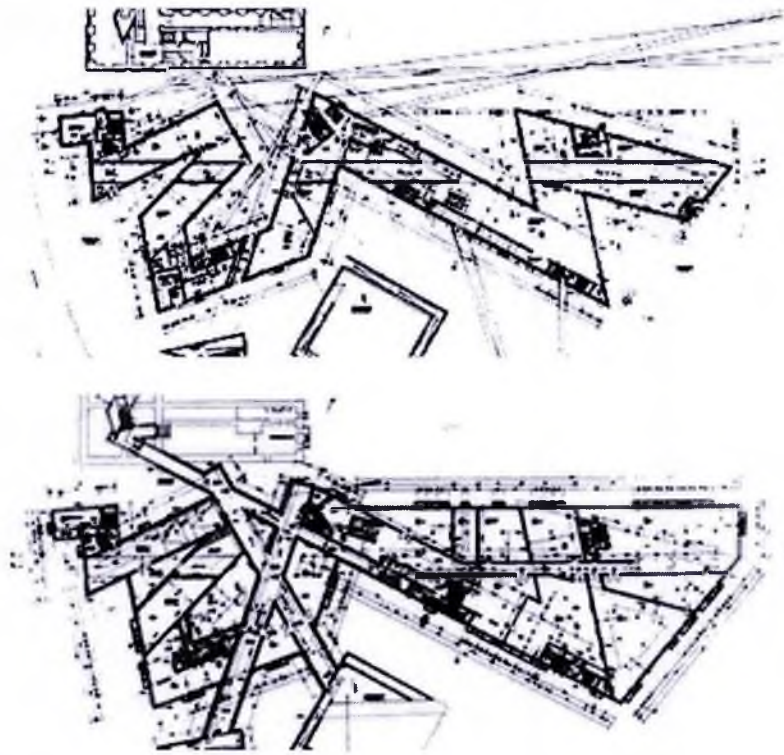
The ground (above) and underground (below) floor plans of the museum
